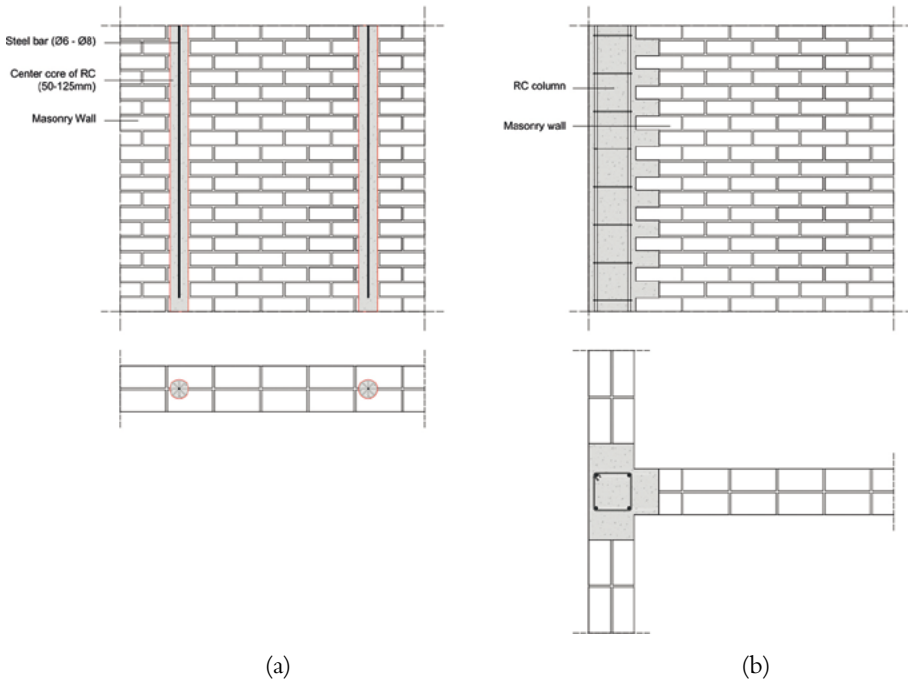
General action with reinforced concrete elements. (a) rigid core and (b) confinement with RC columns and beams.
